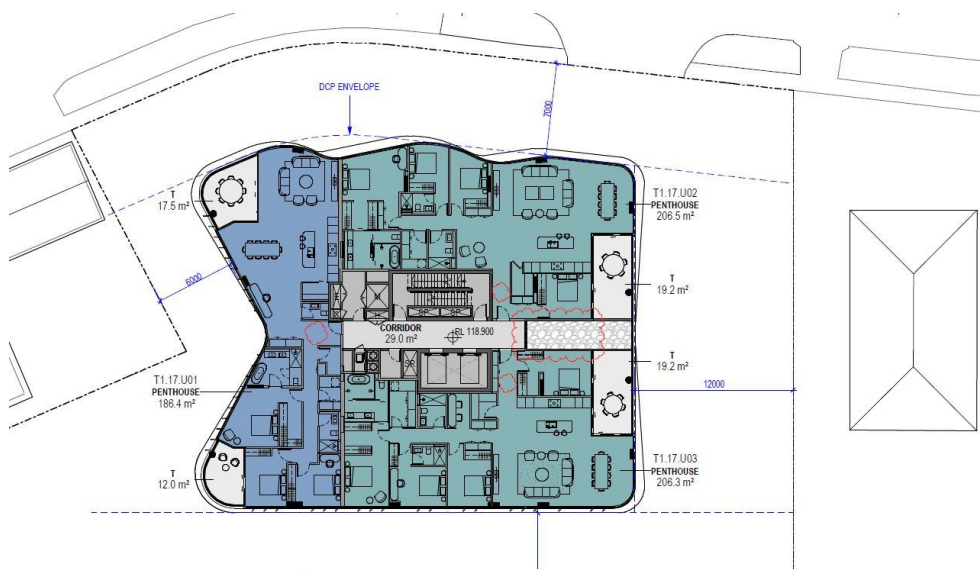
Approved floor plate of Area 1 (Source: Council Planner)
